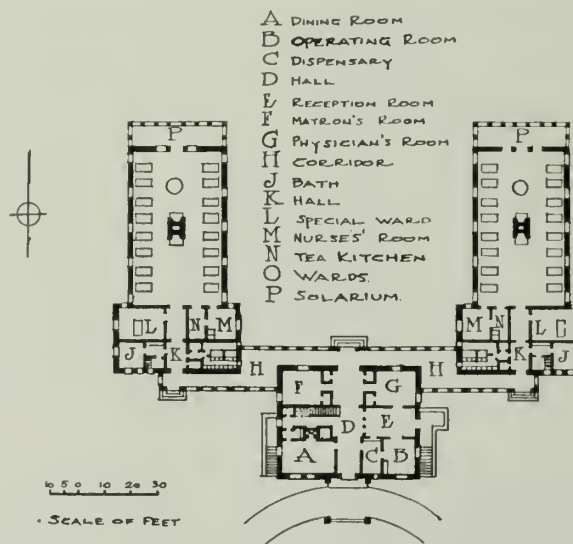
PLAN, CAMBRIDGE HOSPITAL, CAMBRIDGE, MASS. (1886.)
